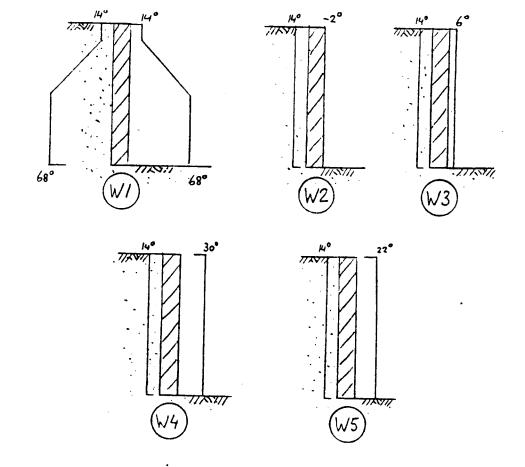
THERMAL LOAD CASES RETAINING WALL
